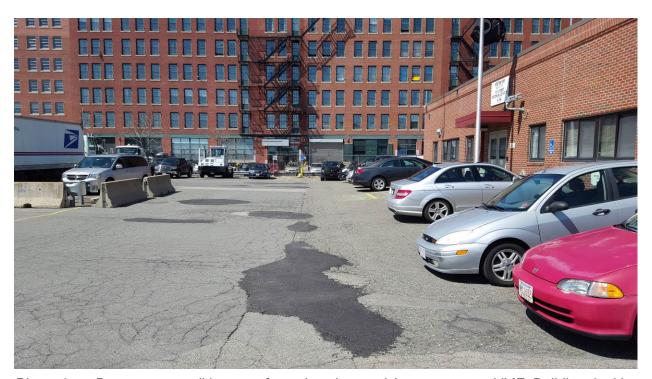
Pavement conditions at front (southeasterly) entrance to VMF Building looking northwest (GRA Photo)
